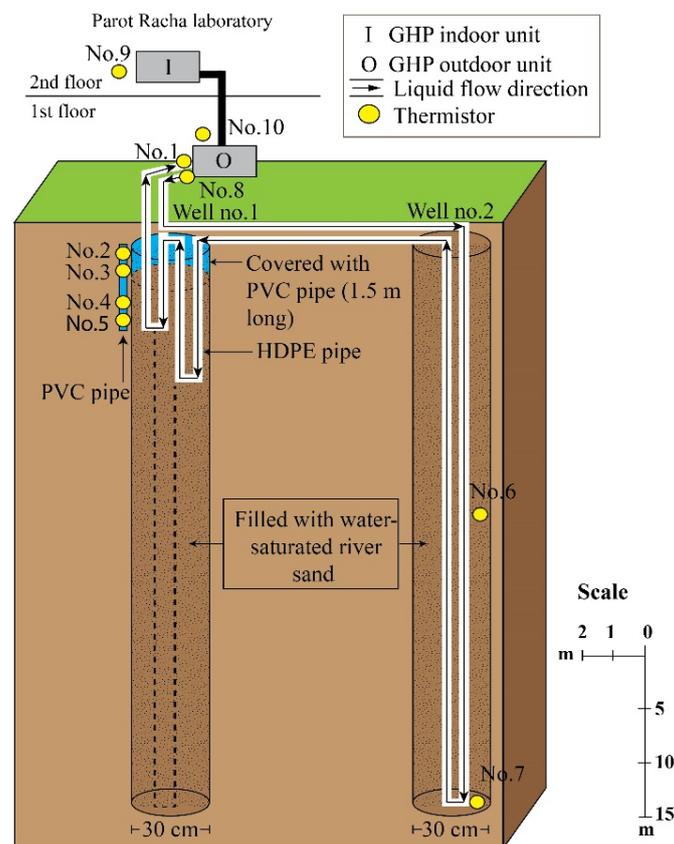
Schematic installation of geothermal heat pump system at Parot Racha laboratory room. Note: HDPE pipe in well no. 1 was broken. Therefore two new HDPE pipes with the lengths of 10 and 15 m were inserted and connected to the well no. 2.
